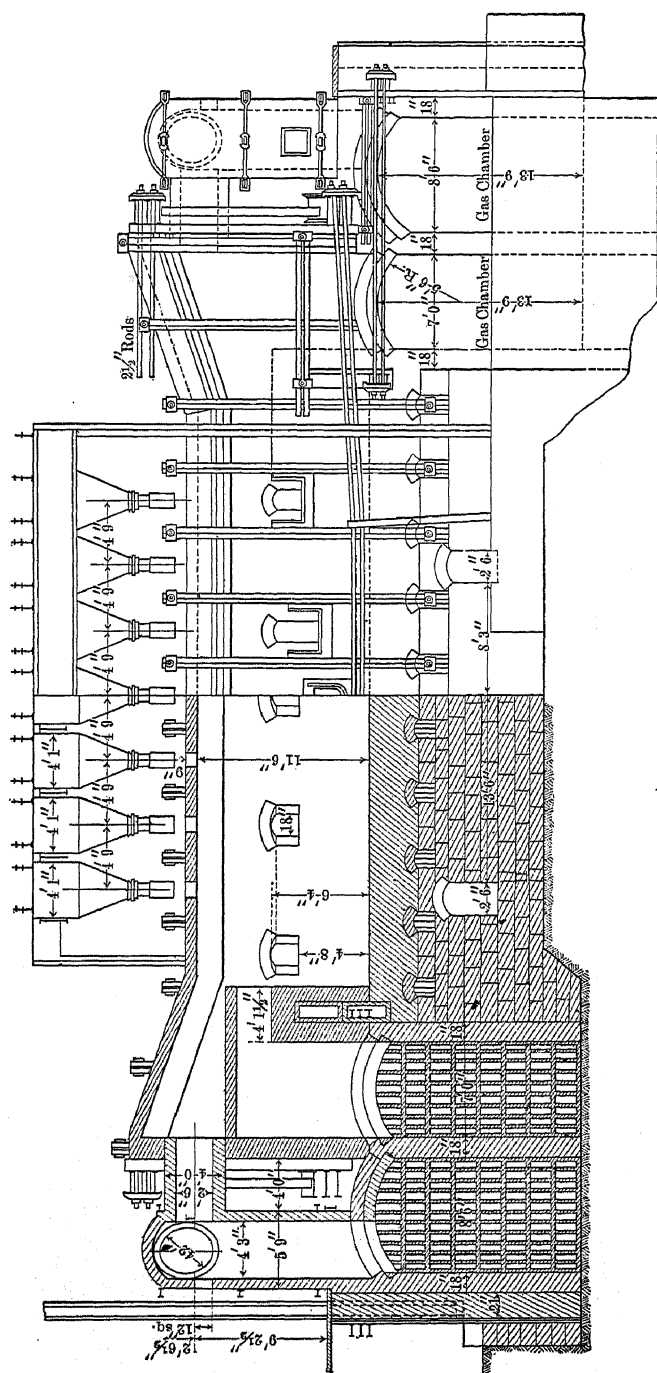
GAS-FIRED FURNACE, ELEVATION. BOSTON & MONTANA REDUCTION DEPARTMENT.
